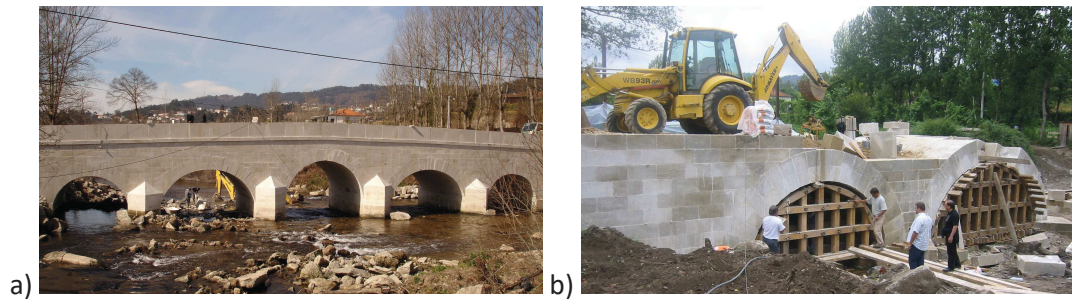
Vila Fria road bridge: a) general overview and b) construction phase
